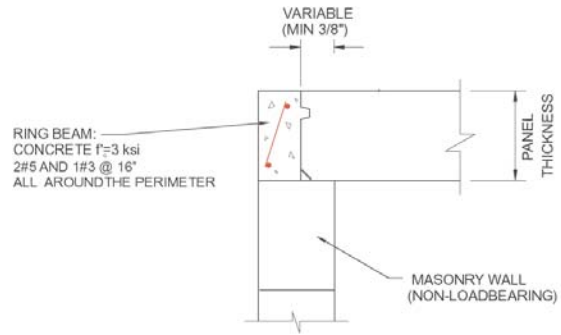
B.7: Typical Reinforcement for ring beams and longitudinal joints
